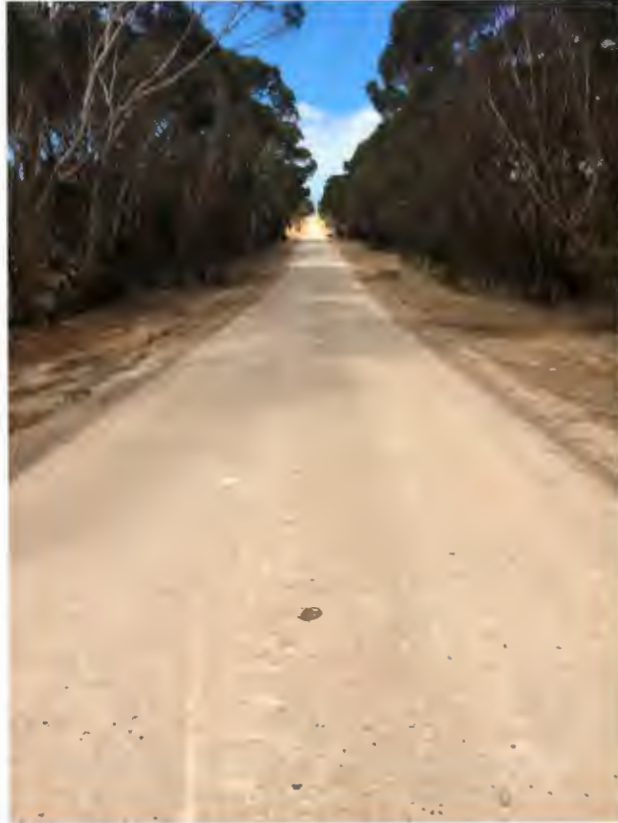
Item 51, large tree located on the edge of North Coast Road.
